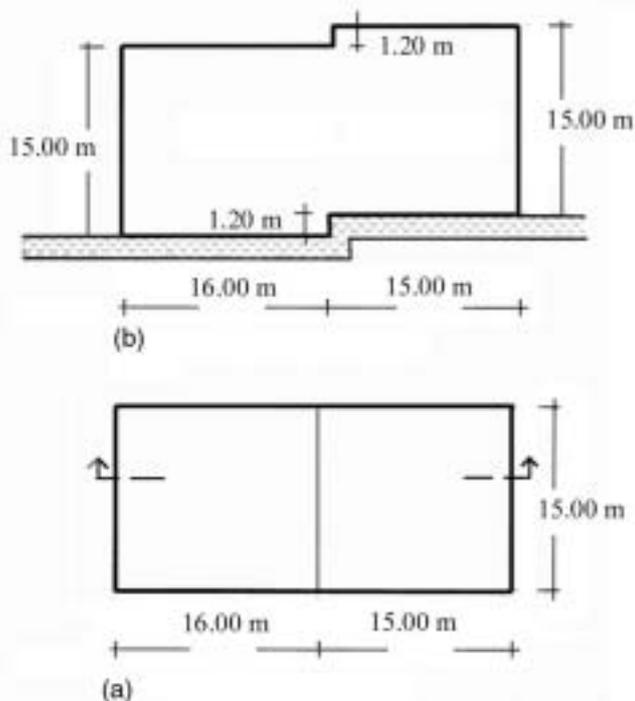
Plan and section drawings for the 'Parking Garage' problem.
